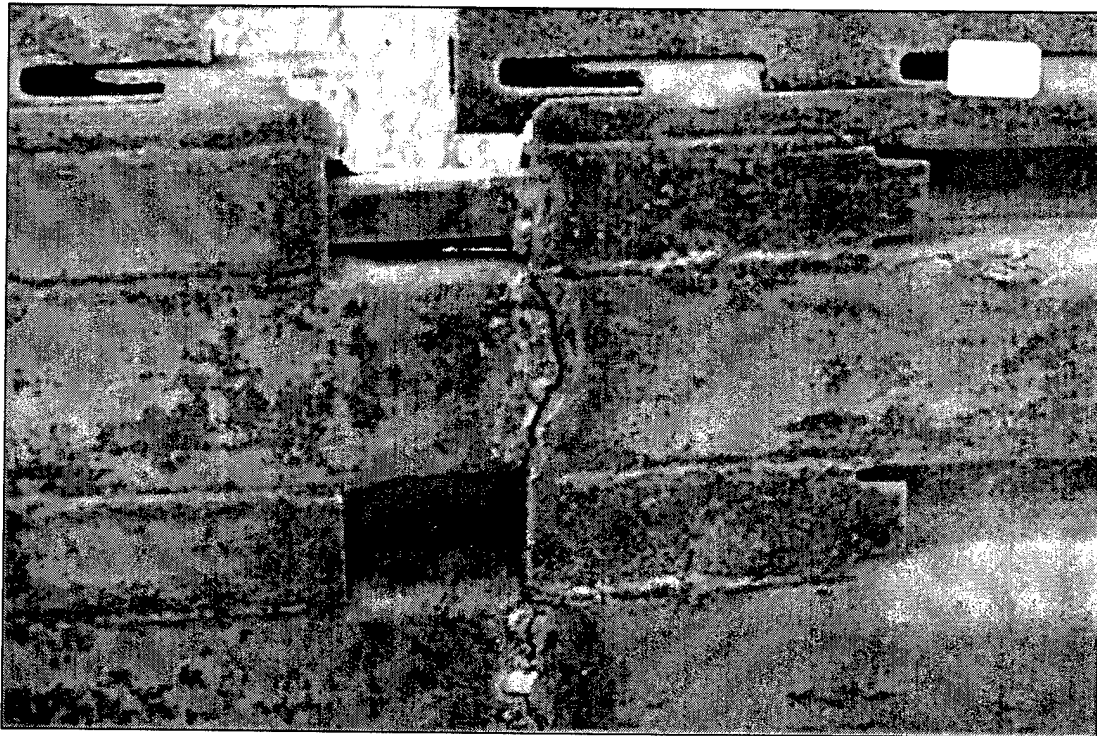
Broken welds between mats and a repair made by welding one side of the square attachment pin.
